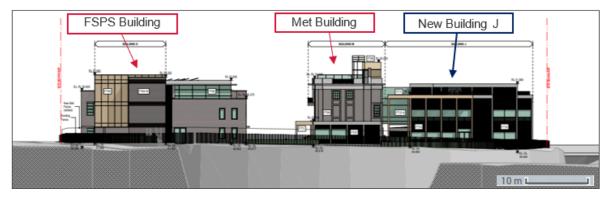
| Western elevation (Source: Applicant's RtS 2020)
